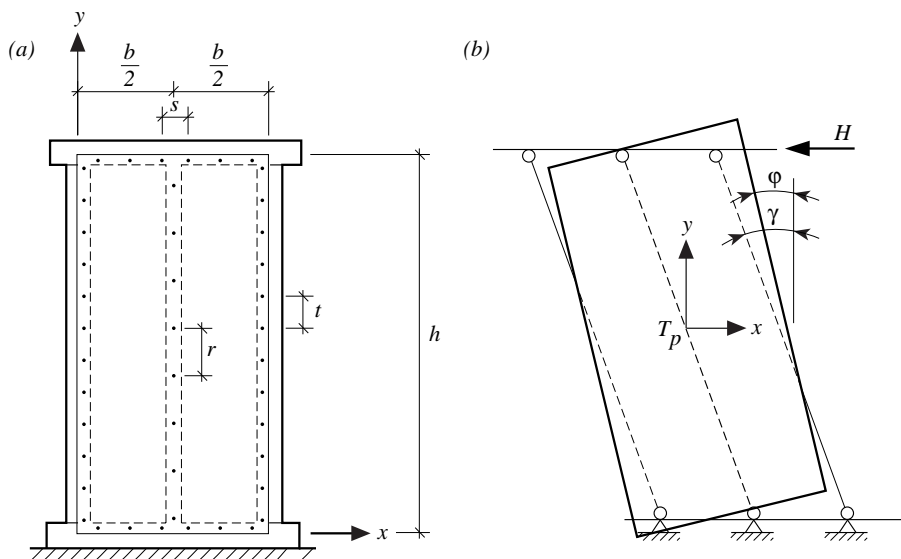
(a) Typical wall element, (b) principal structural behaviour. (STEP 1995 Article B13)
